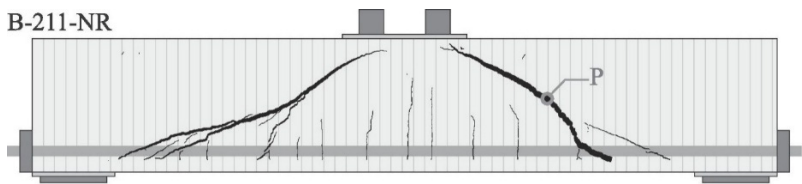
Cracking pattern for a beam with passive longitudinal reinforcement [13].
